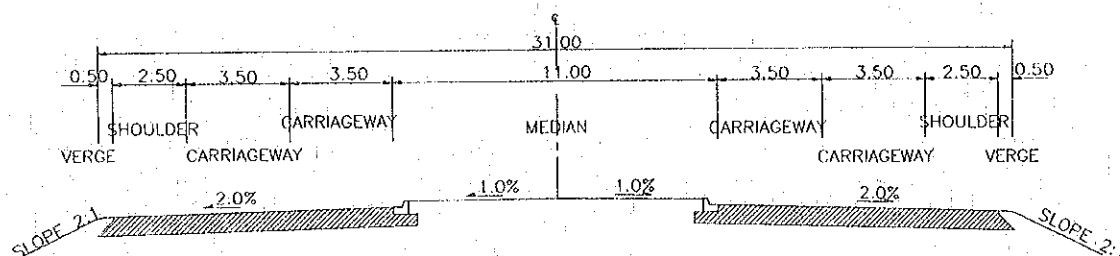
Typical Cross-section of the Connecting Road on the Thailand
